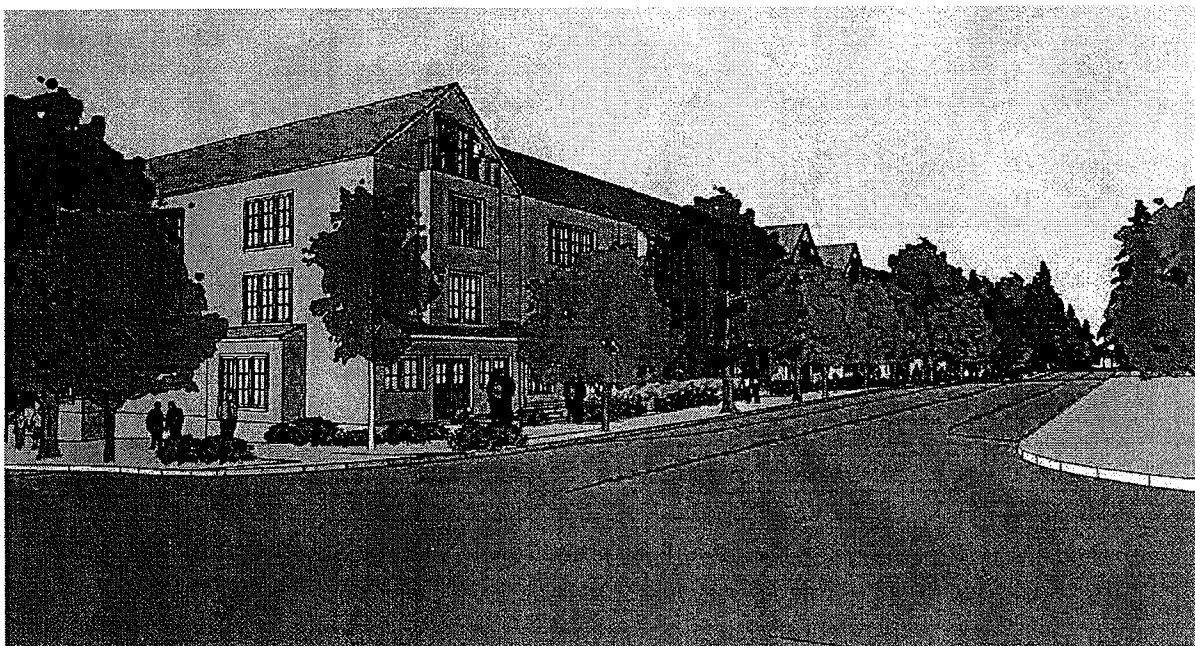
Looking Northwest towards Townhouses on Stone Avenue N
